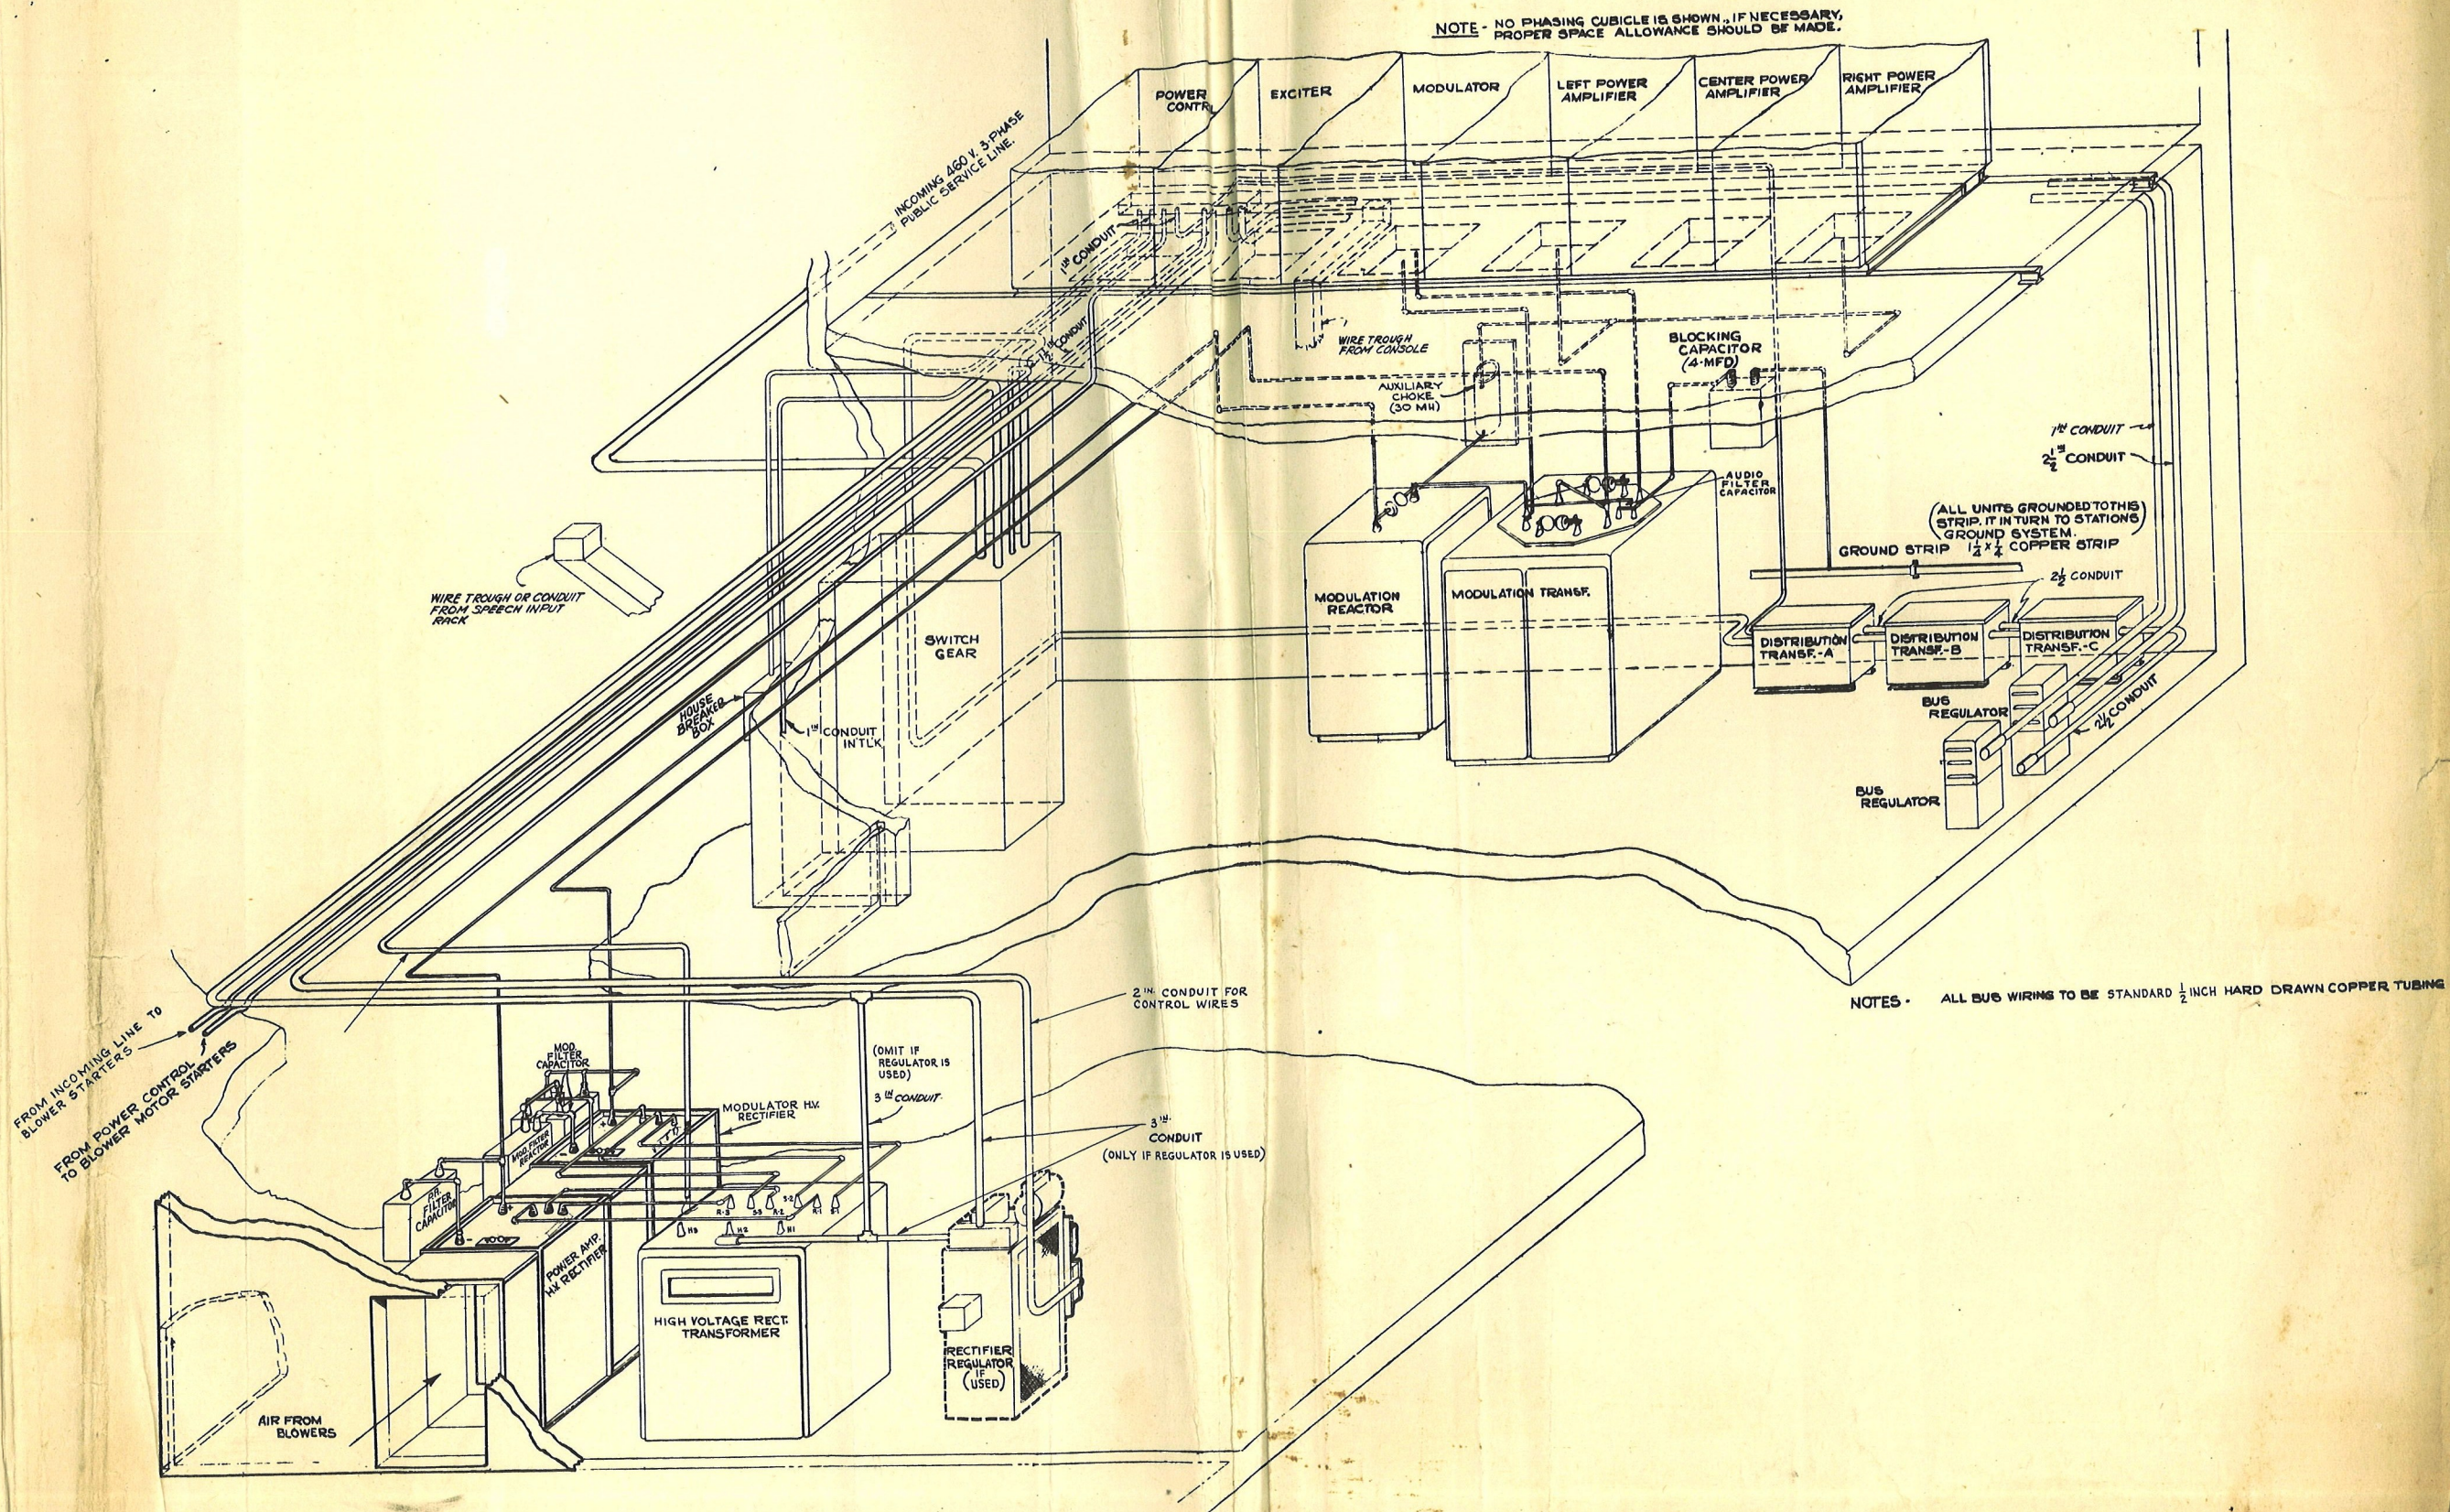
Power Room Layout (Two Floor) (Dwg. 55-A-8214)
